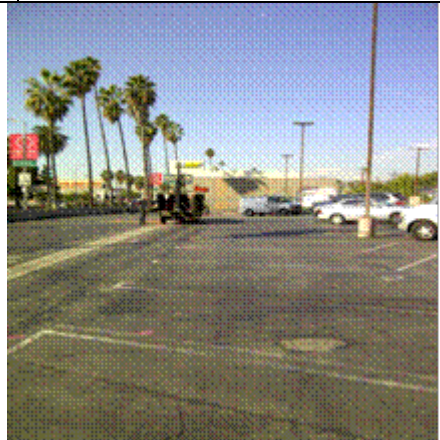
View west along West Sunset Blvd, location of soil borings B1, B2, and B3
